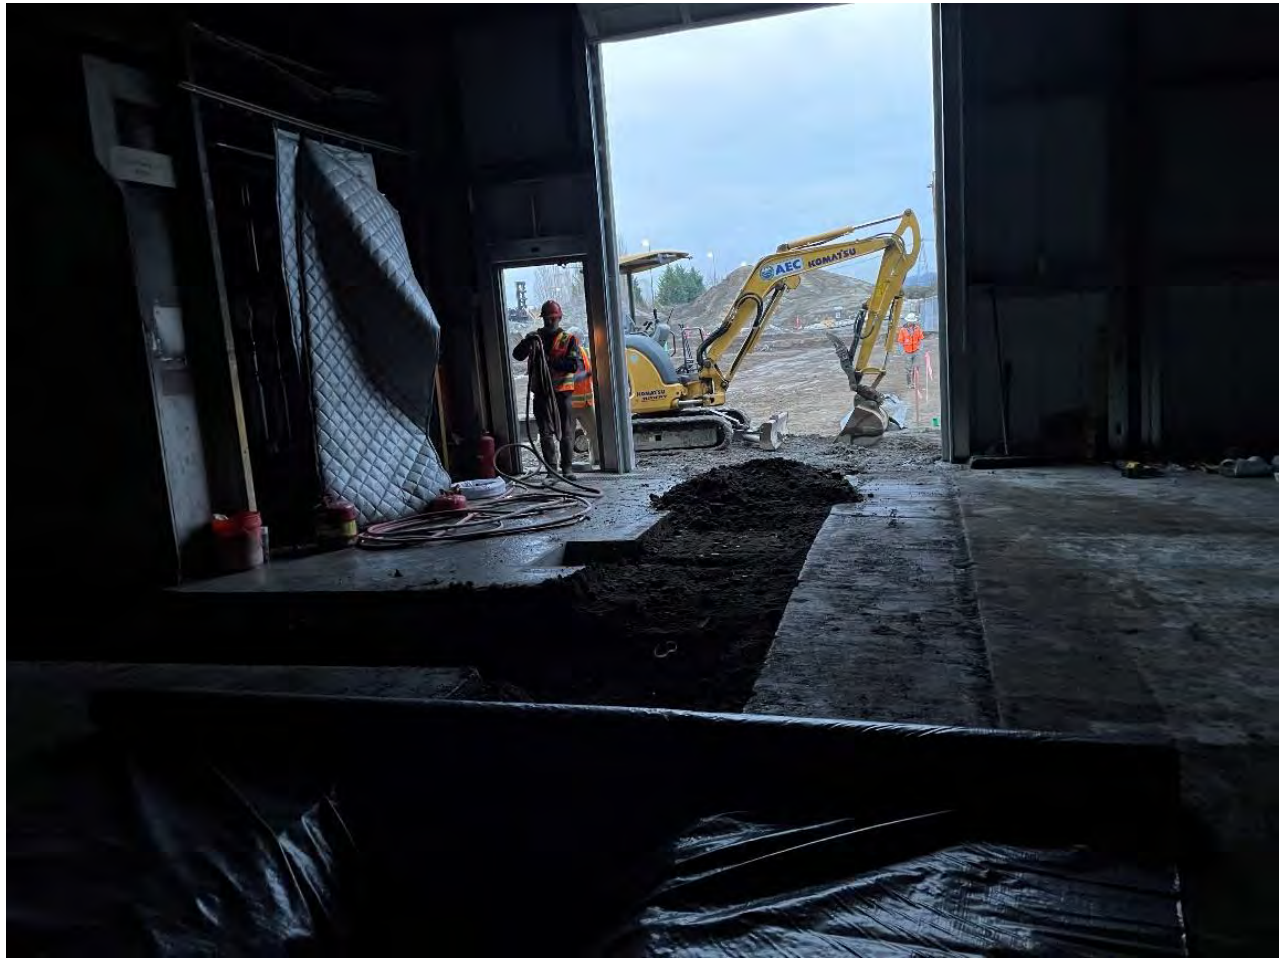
Overview of AS/SVE Building trench at start of excavation, facing North
